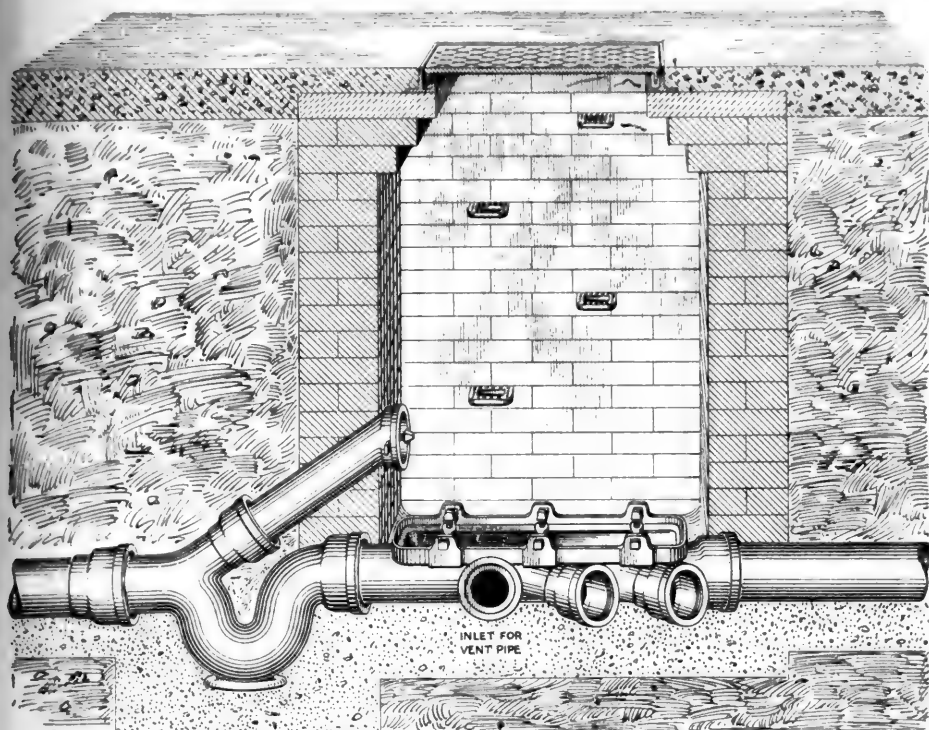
Section of Manhole showing combination of inspection chamber, disconnecting trap with clearing arm, iron steps and manhole cover.
